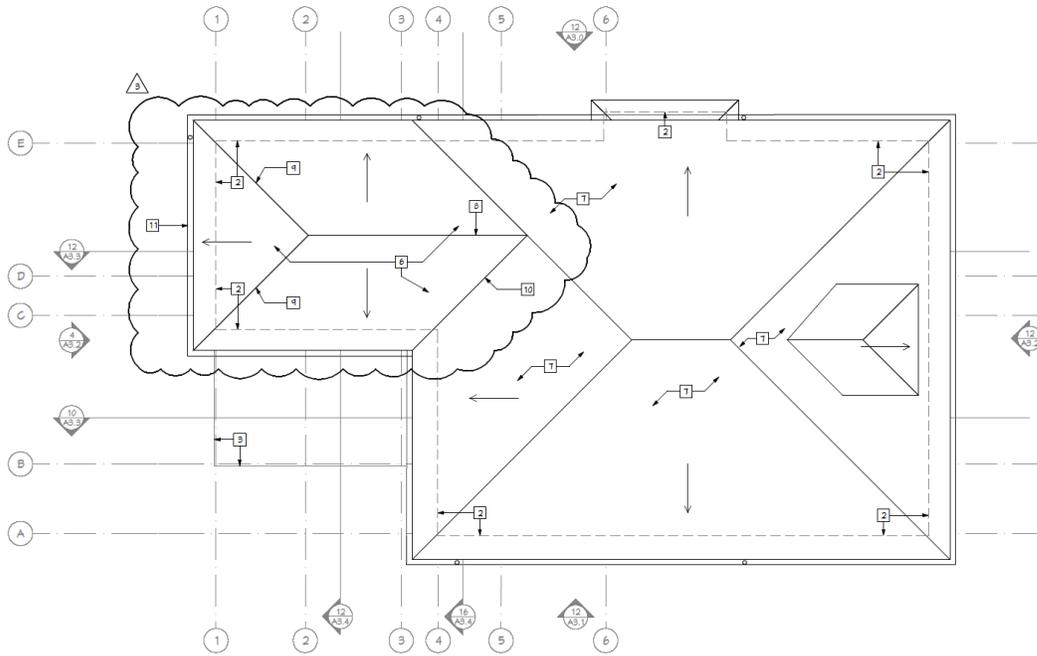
Roof Plan (not to scale) – Approved in 2024, #B2024-02185
